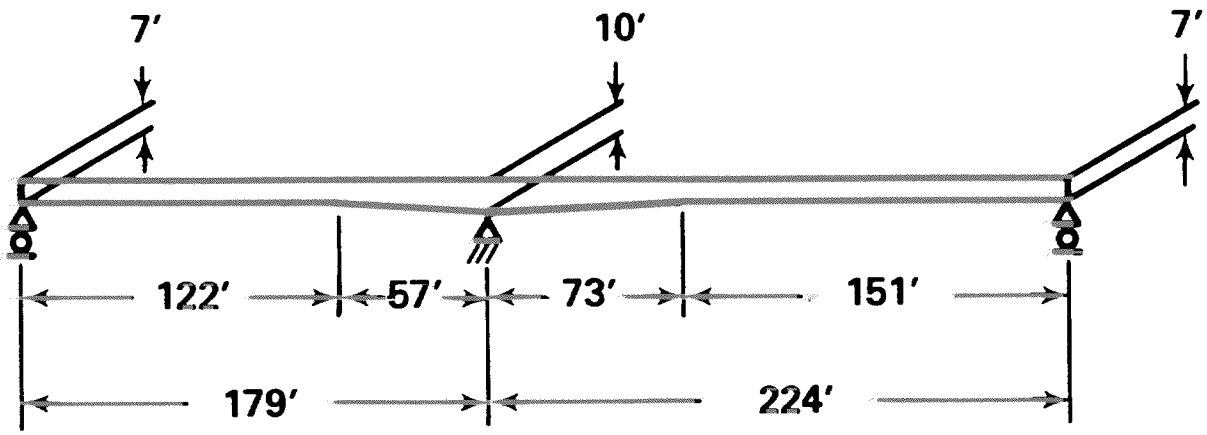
Web Elevation of Mass-Transit Railway Bridge
